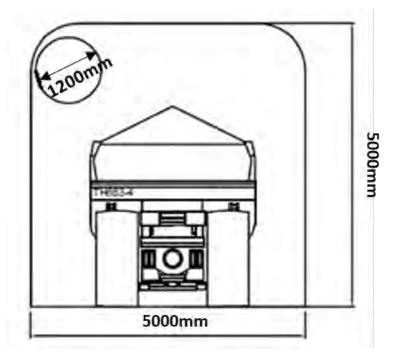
17 t LHD in a Typical 5 m by 5 m Development End
